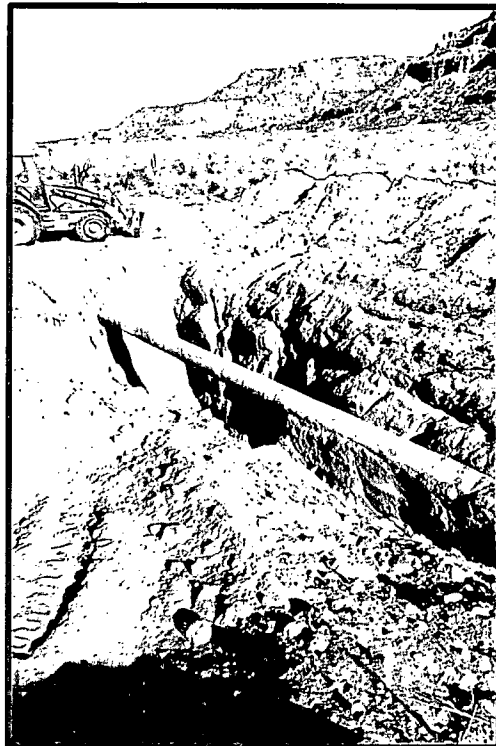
Near complete excavation of the Trunk K #7 pipeline release site.
